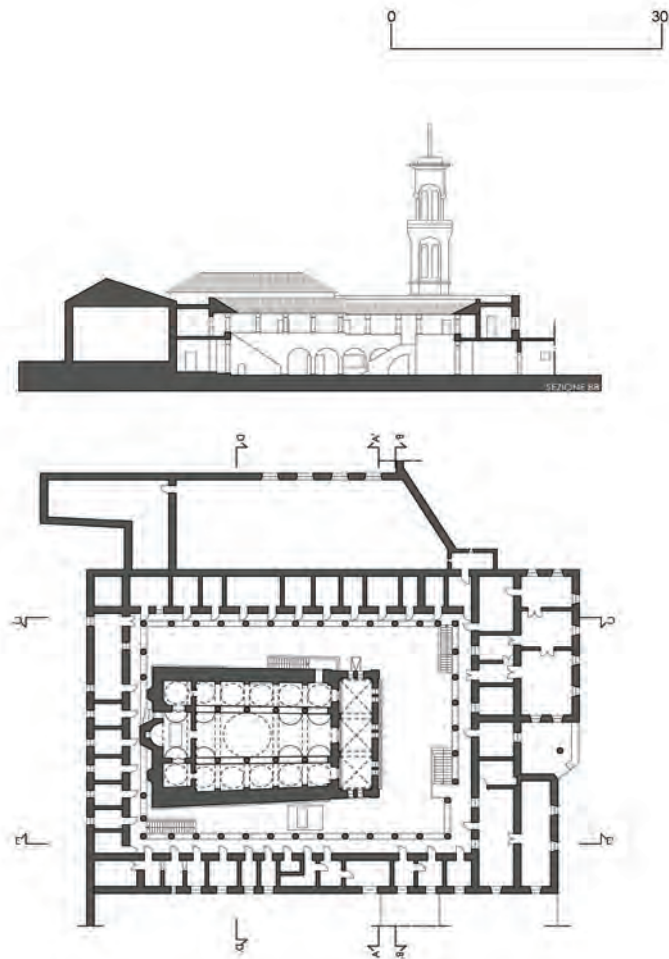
The Monastery of the Assumption of the Virgin Mary on the island of Hydra, section towards west and planimetry first floor
